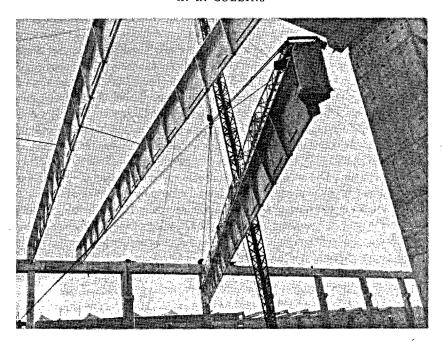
Precast prestressed secondary beams in the new hangars for British European Airways at London Airport.
